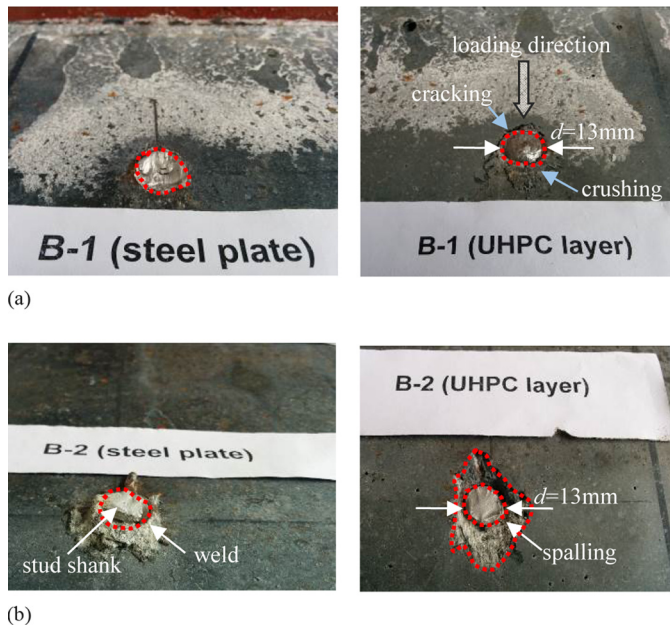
Two fracture positions of headed studs: (a) Failure Position 1 (from weld); (b) Failure Position 2 (from stud shank)
